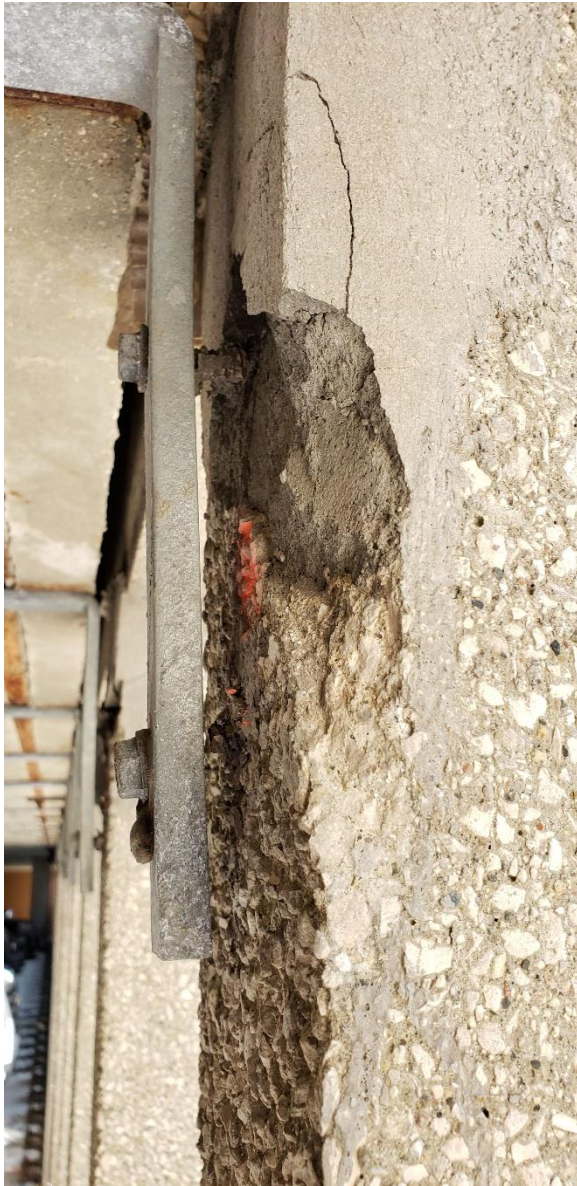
Post-installed panel connection with a spall at the top bolt and a fracture at the bottom bolt.
